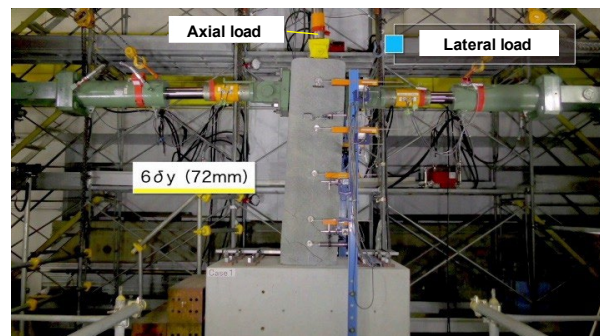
Reversal cyclic loading tests of RC column built using LACTM formwork.
